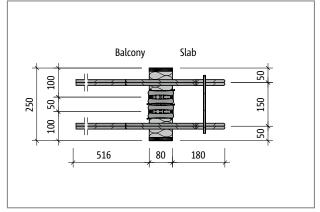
Schöck Isokorb® T type Q-E-W-VV5: Product layout
